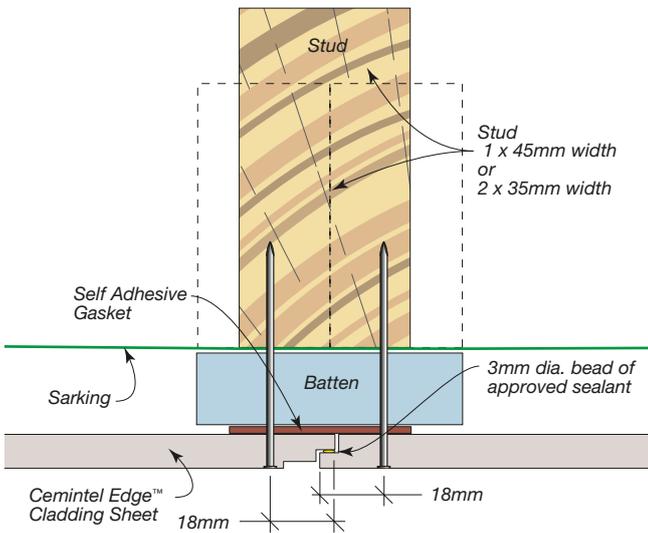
Vertical Joint – Timber Framing – Mosaic™ Cladding only
